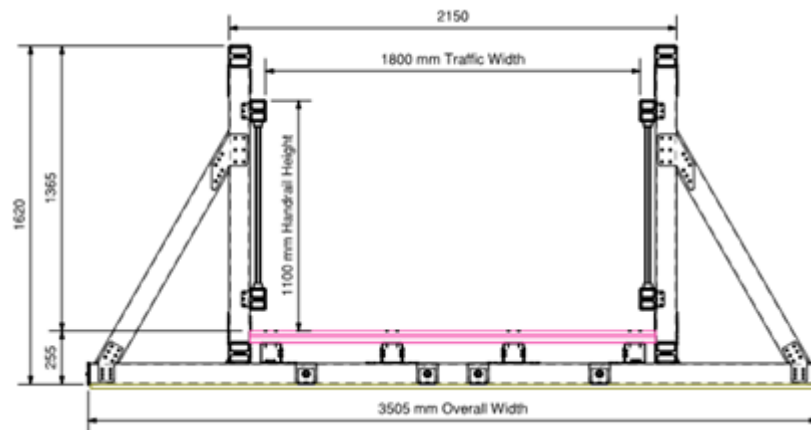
JC Slaughter Falls Footbridge – Cross Section
